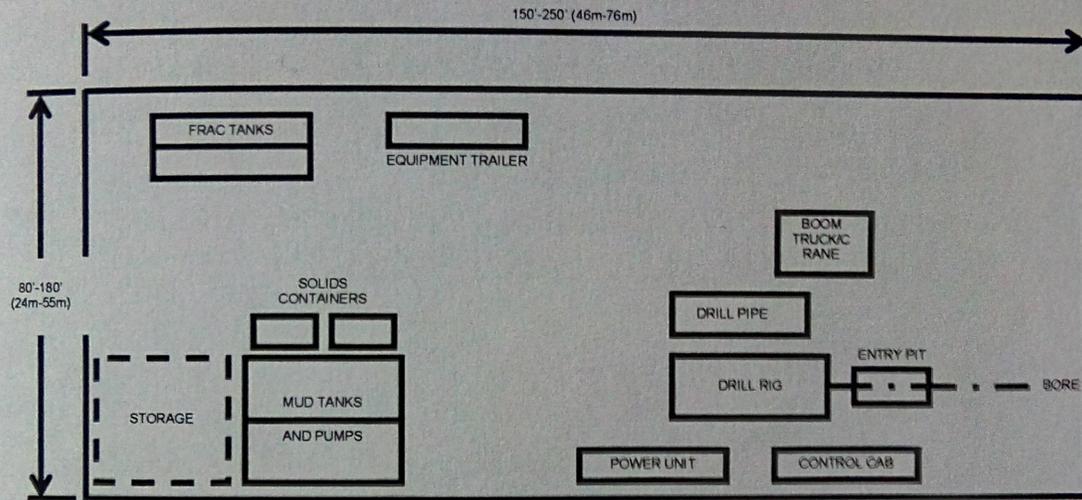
Typical Rig Side Work Area and Equipment Lay-Out for Large HDD Projects
